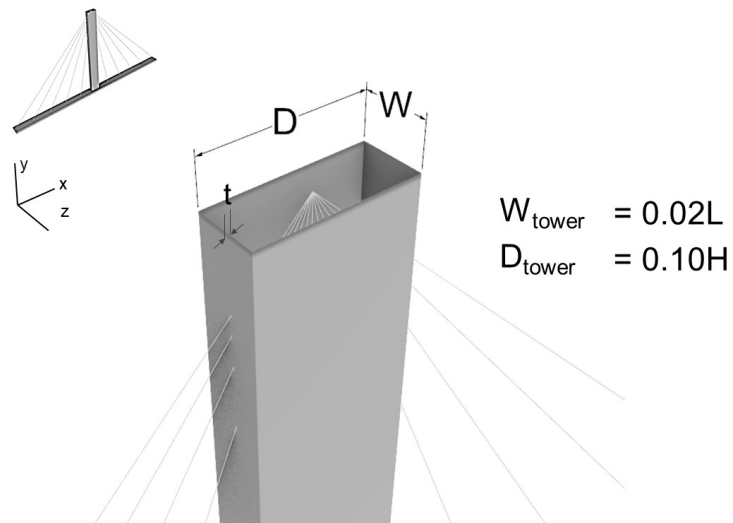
Depth D_{tower} and width W_{tower} of the bridge tower
